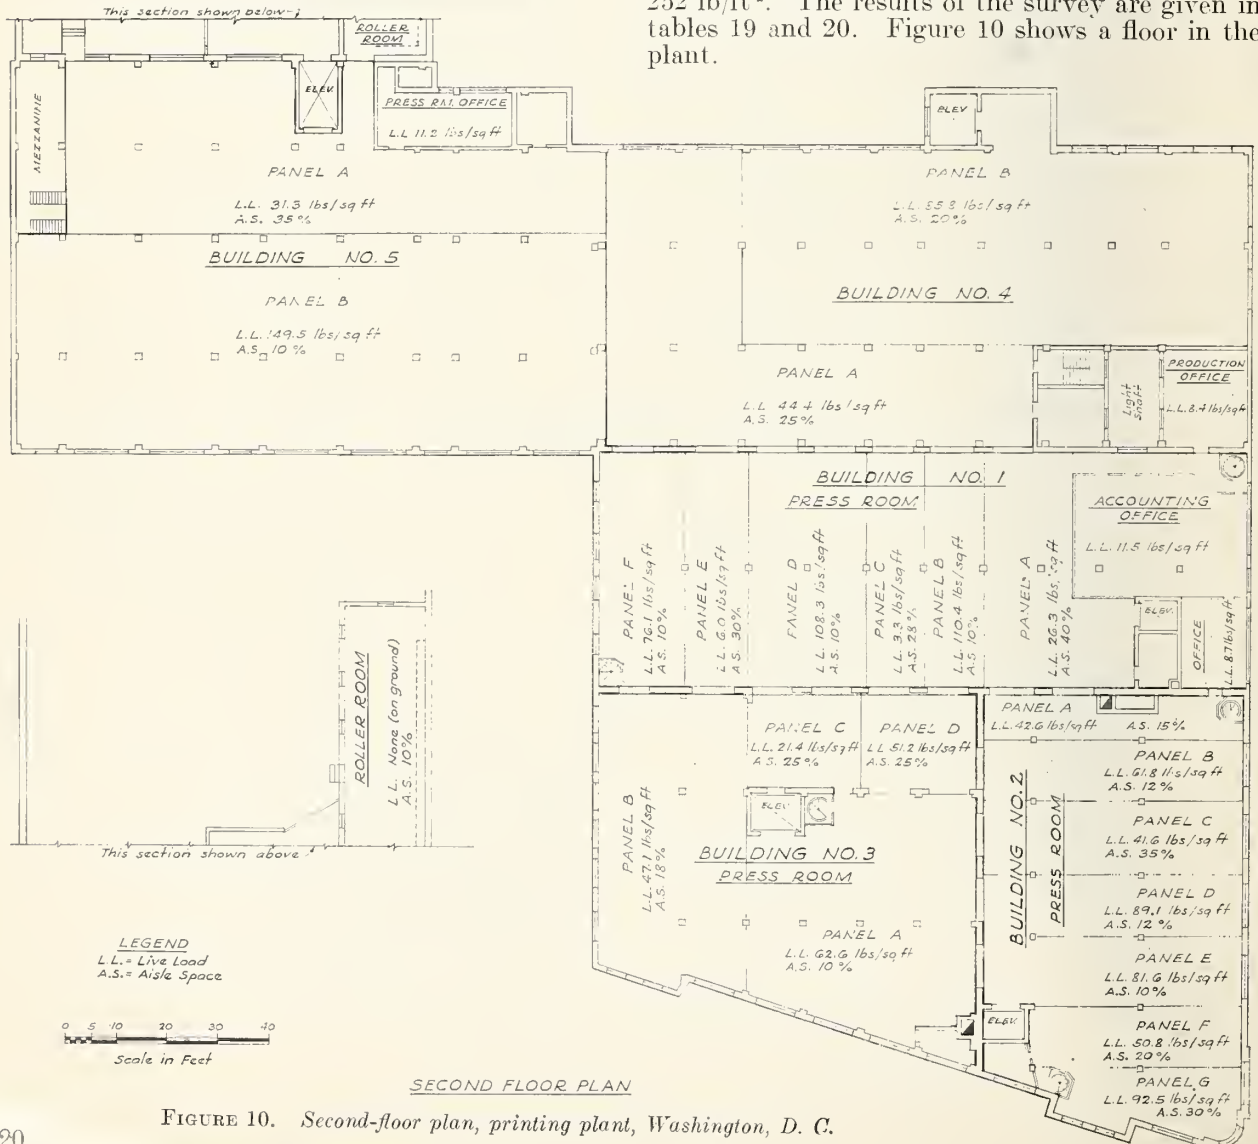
Second-floor plan, printing plant, Washington, D. C.
